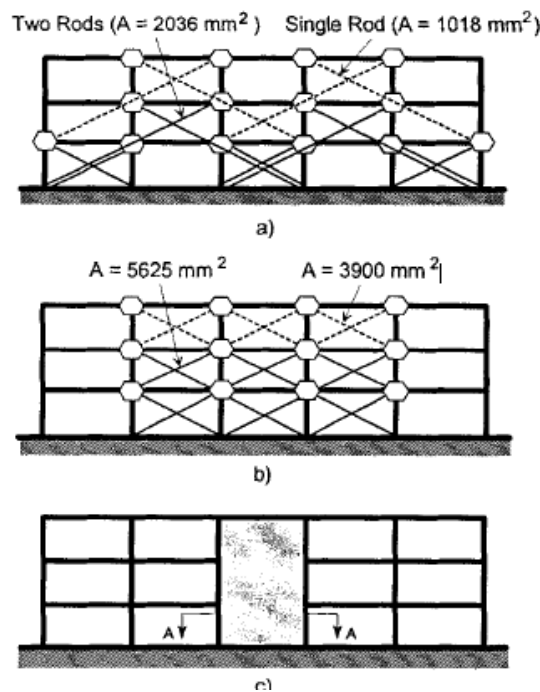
Retrofit Schemes for Three-Story Building: (a) Posttensioned Bracing; (b) X-Bracing; (c) Infill Wall
